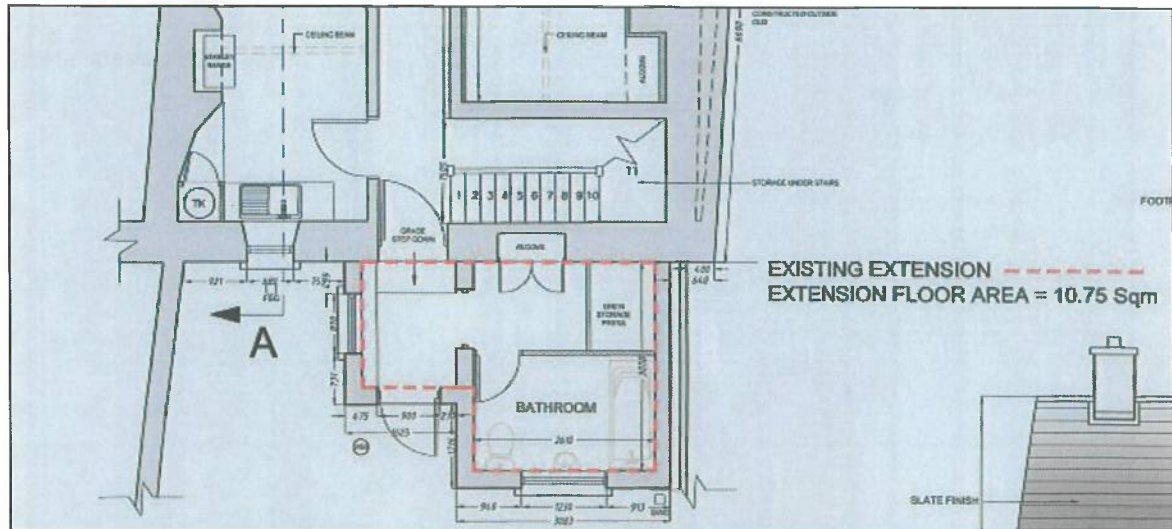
Existing floor plan (as submitted) – note ground floor extension of 10.75m².
